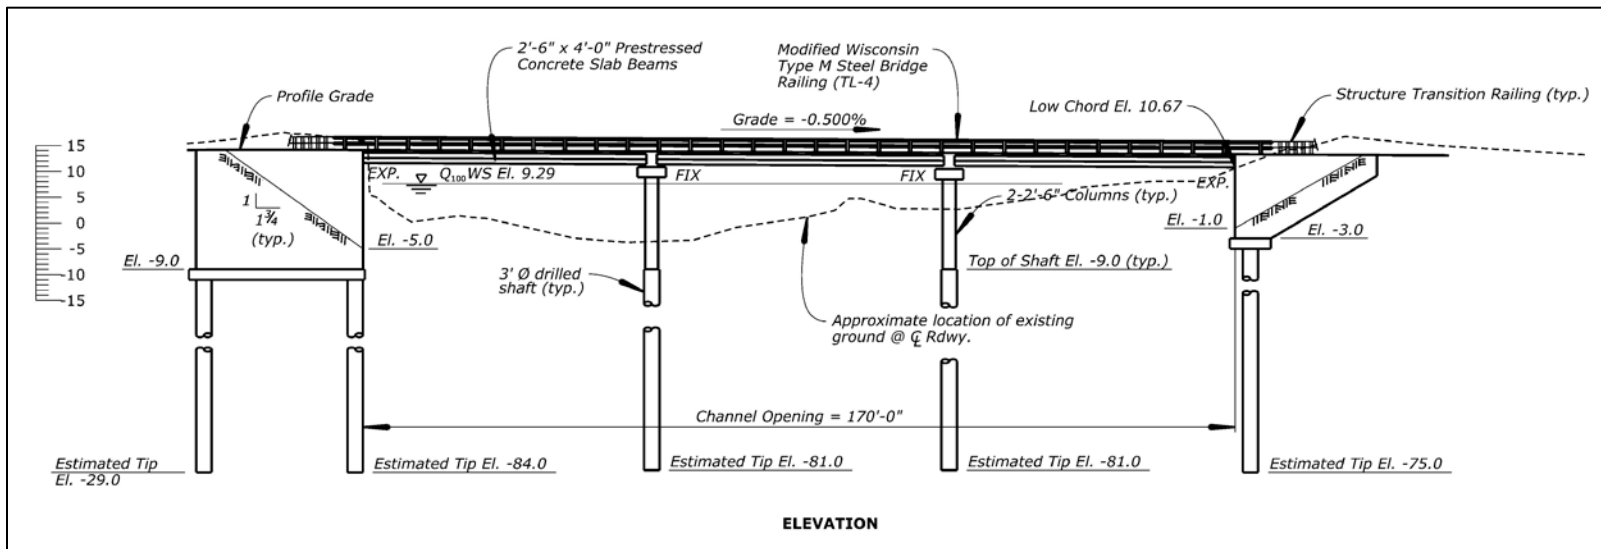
Proposed Preliminary Design of Bridge 3, Elevation View
